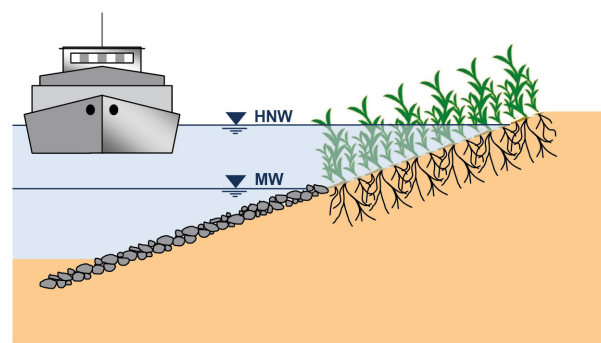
Schematic cross-section of a bank slope with technical-biological bank protection above and riprap below MW (mean water level), HNW = Highest navigable water level.
